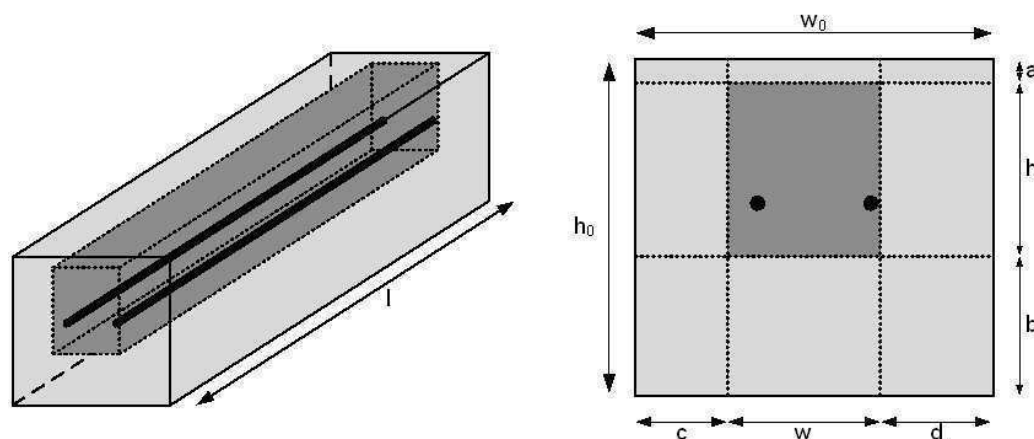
Specimen for photogrammetric observations of load induced cracking. Left: Original specimen (light grey) and final specimen after cutting (dark grey). Right: Cross section of original specimen (light grey) and final specimen (dark grey) along with measures. The illustrations are not in scale. From [Solgaard et al., 2013].
